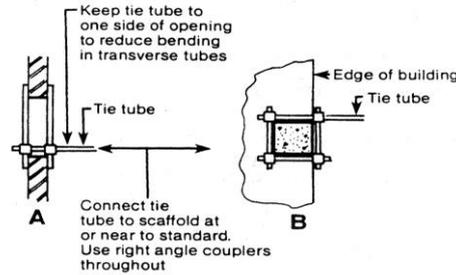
Box tie. A. Vertical or horizontal section through wall. B. Horizontal or vertical section through structural member.
